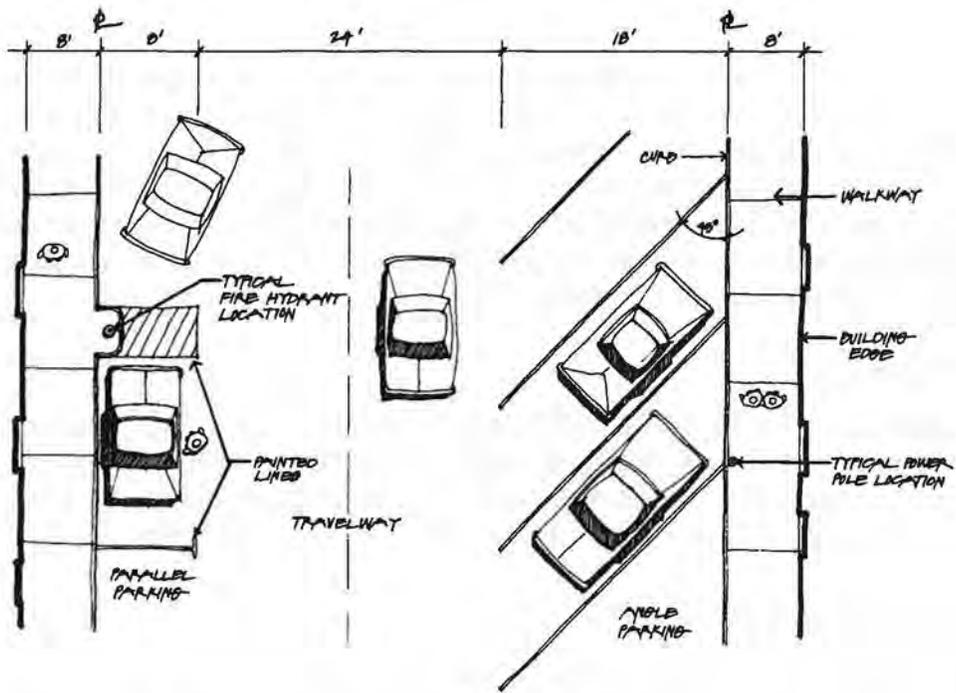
PROPOSED HANA HIGHWAY—PLAN
